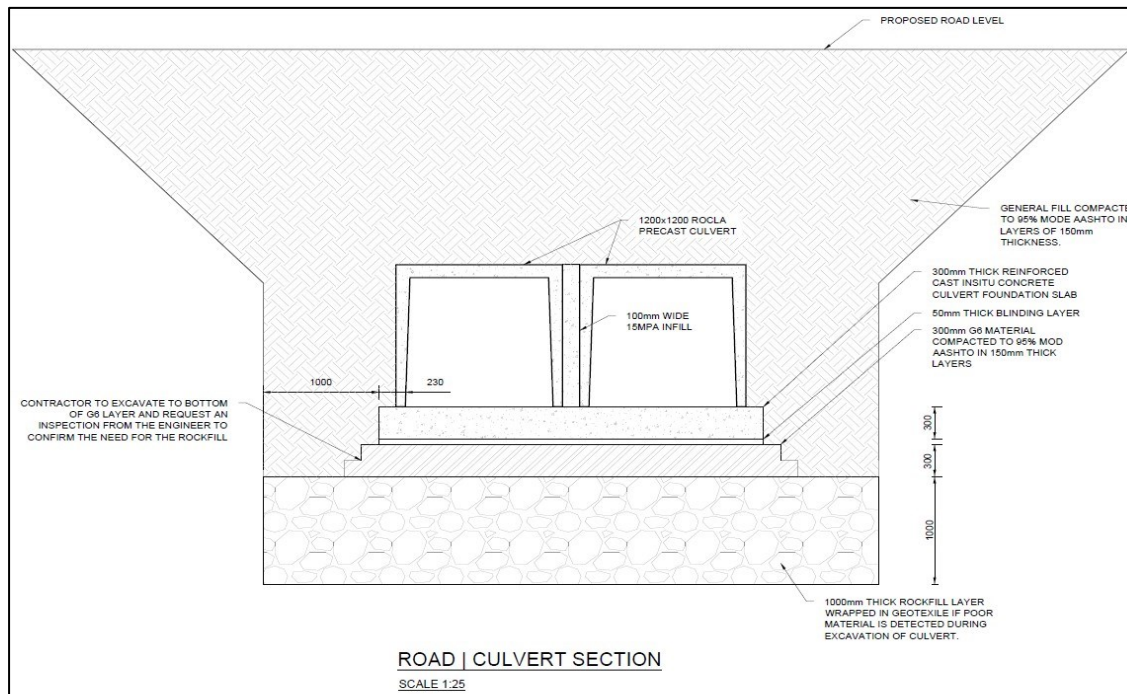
Overview of the Culvert Proposed at WC1, Including Erosion Control Measures (Source: Struxit Projects, 2022).
